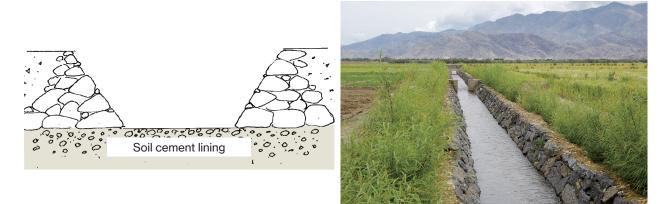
Stone Masonry for a Small Canal Wall³⁾
